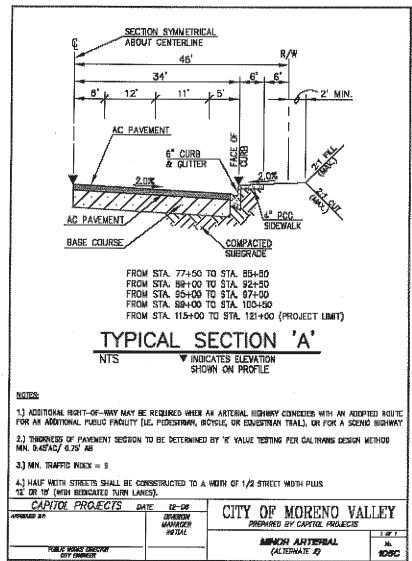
Cross Section 105C: Minor Arterial Alternative 2
